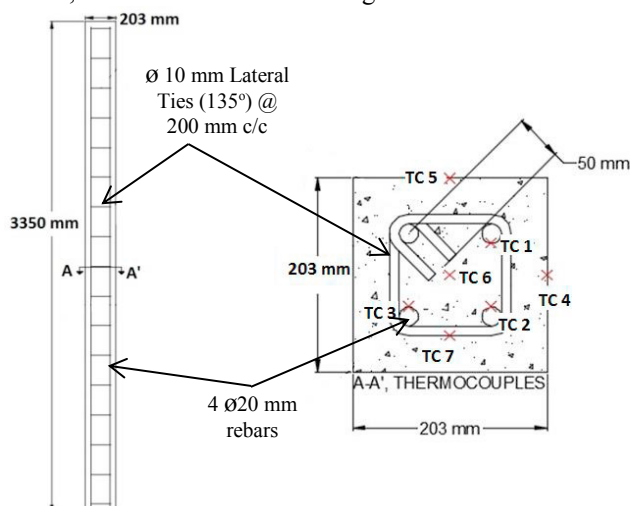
Dimensions, reinforcement details, and instrumentation configuration of RC columns.
